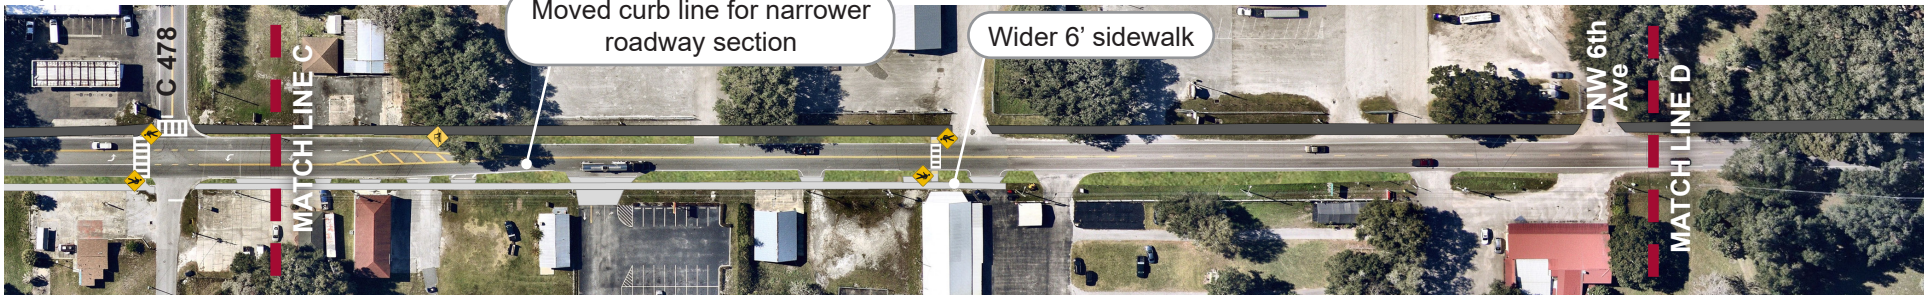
Improvement Options Aerial - C 478/NW 4th Avenue to NW 6th Avenue
